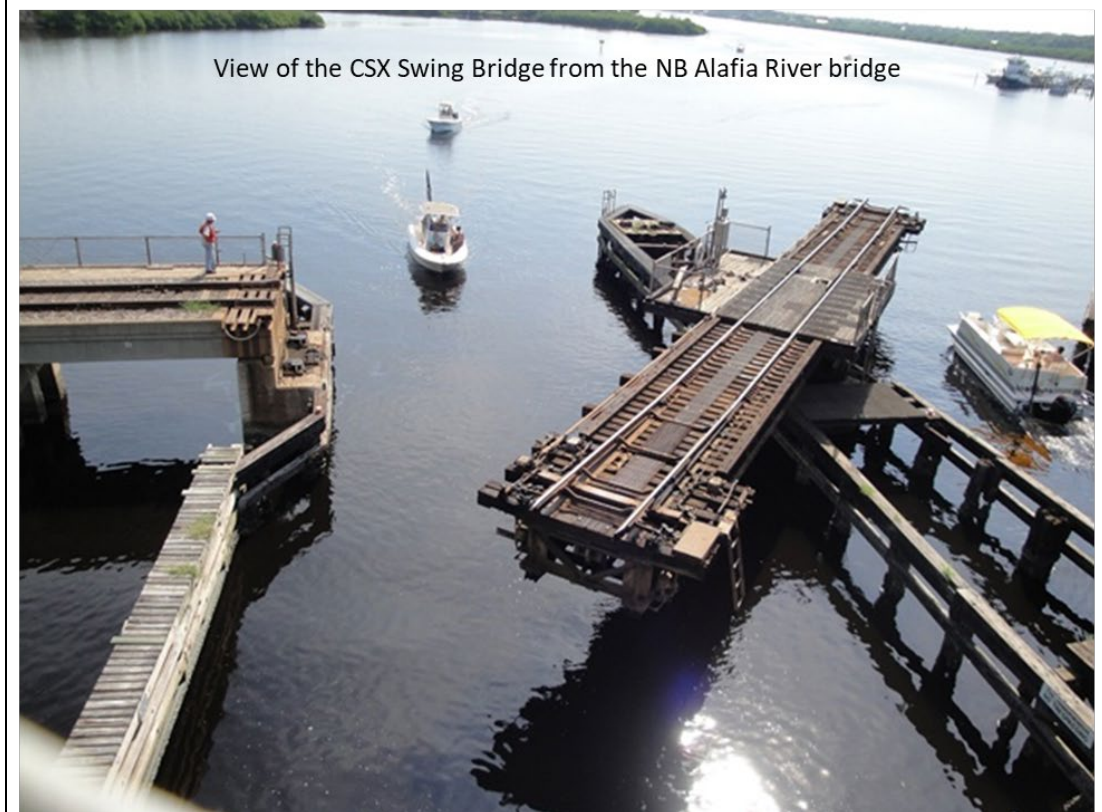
| CSX Railroad/Alafia River Swing Bridge and Tender Station
